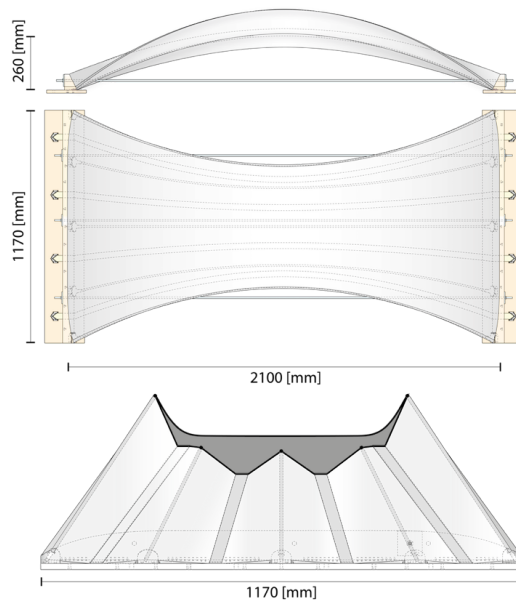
Elevation, plan and cross-section views of the final bridge design.
